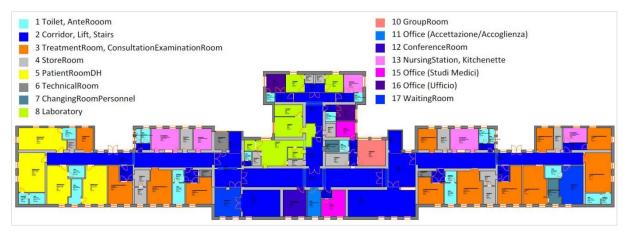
The new layout of the first floor of San Luca Vecchio building
